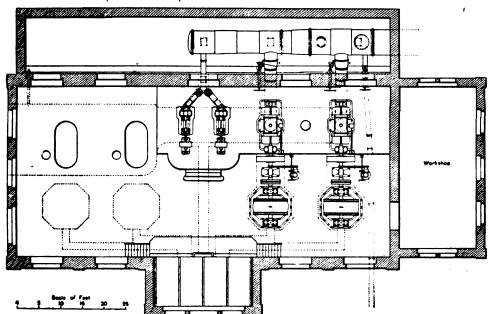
PLAN OF POWER HOUSE, JUNGFRAU RAILWAY.
